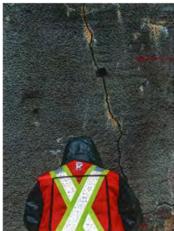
Cracking in the West Elevation, north end (Prima West, Jan. 27, 2020)
